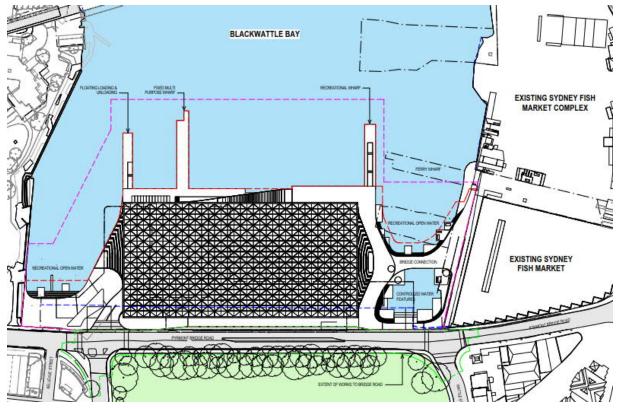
New Fish Market site plan (source: UrbanGrowth NSW via email 27 August 2018)
